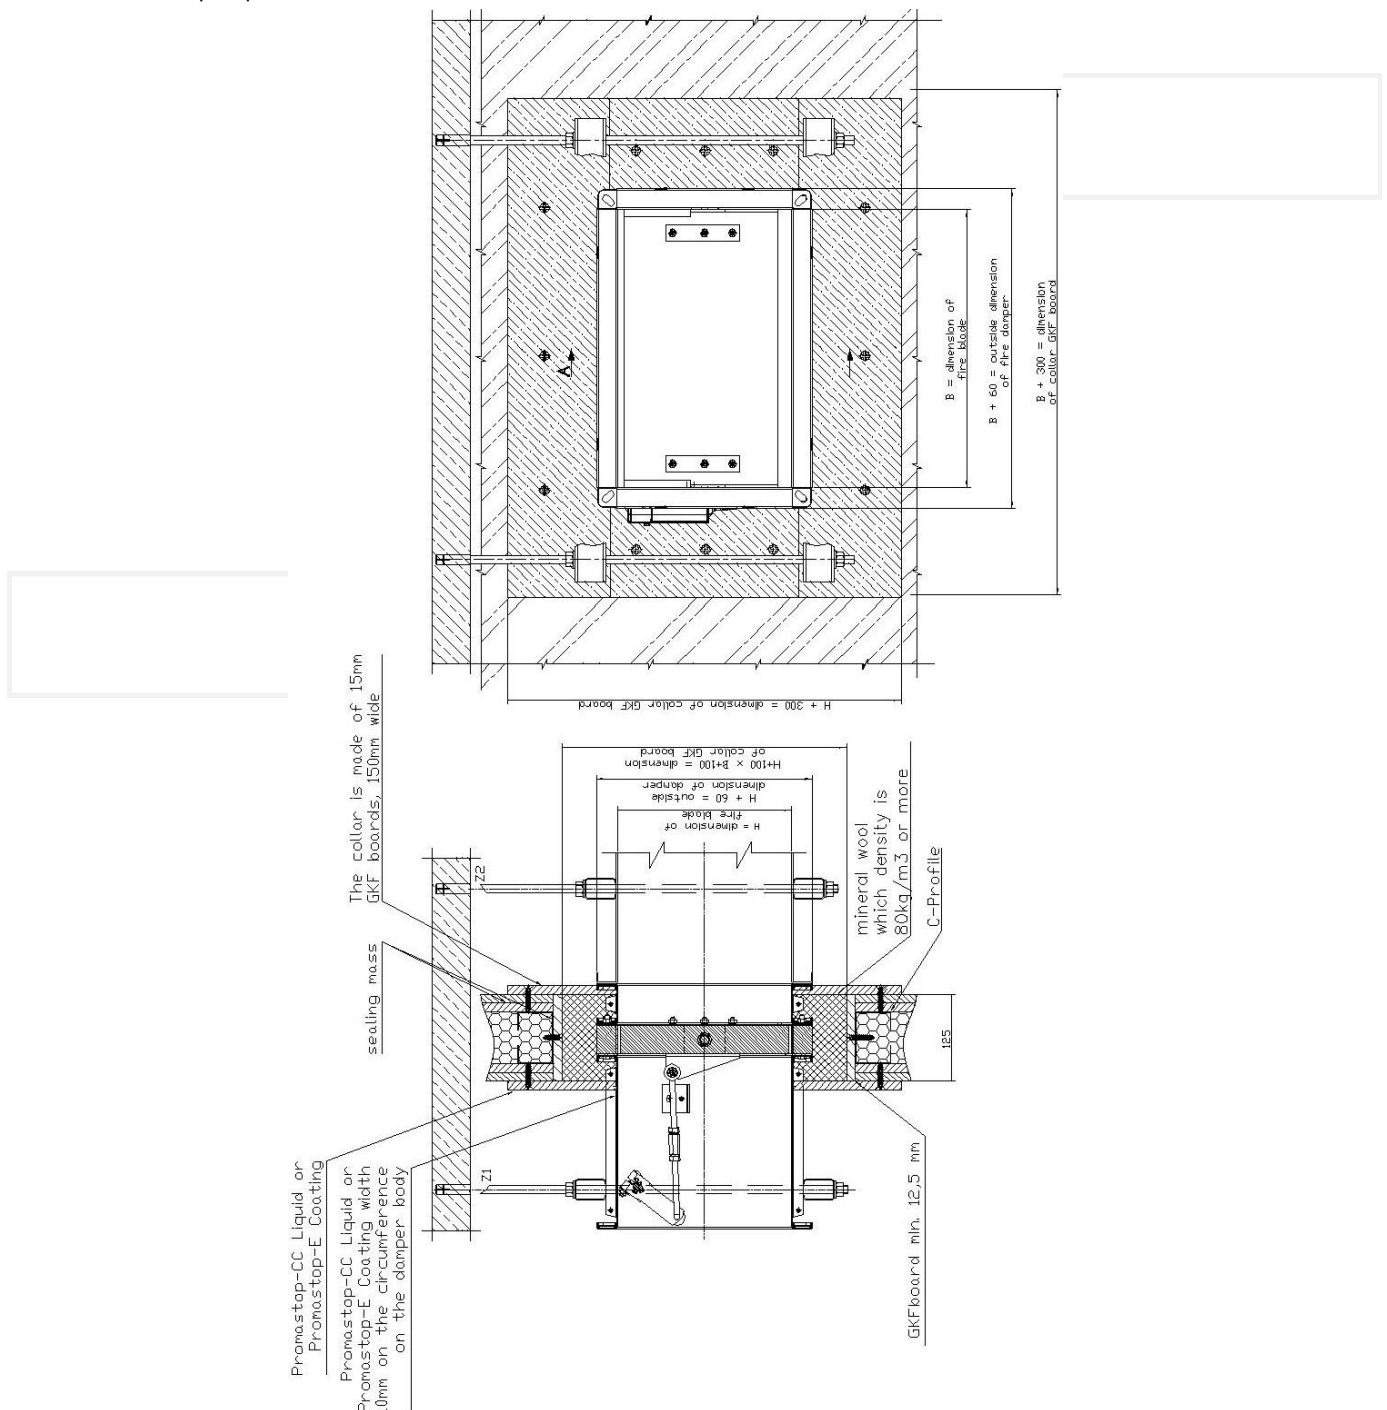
Installation method of fire dampers KWP-O in flexible wall
